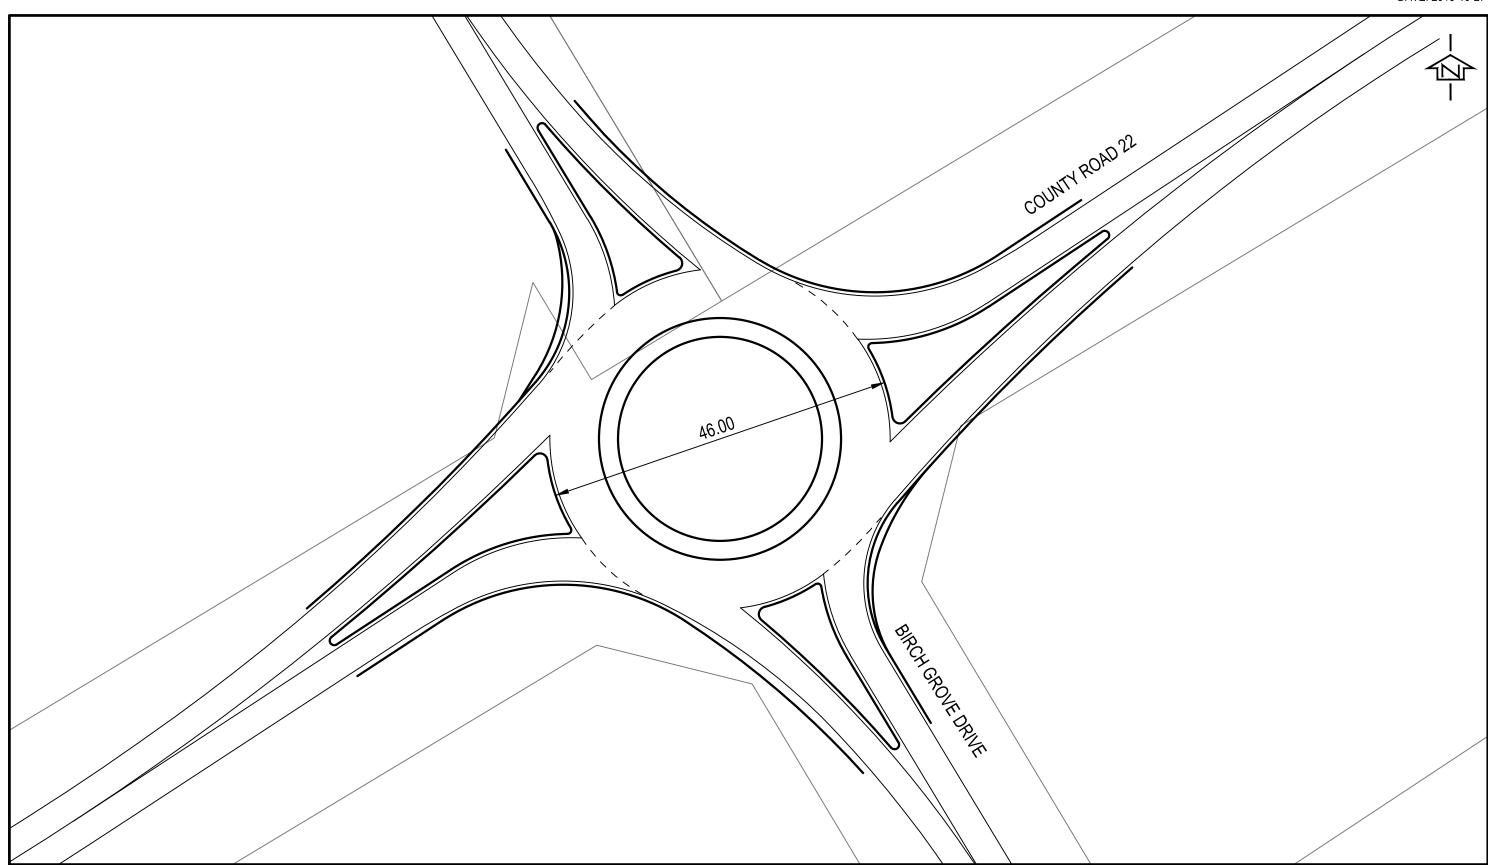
Roundabout Concept at County Road 22 and Birch Grove Drive
